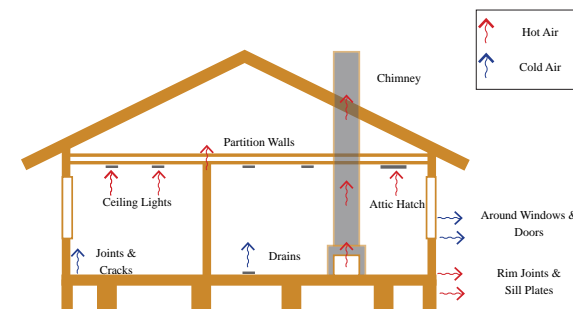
Common Air Leaks. Air infiltrates into and out of a home through every hole and crack. About one-third of this air infiltrates through openings in ceilings, walls, and floors
